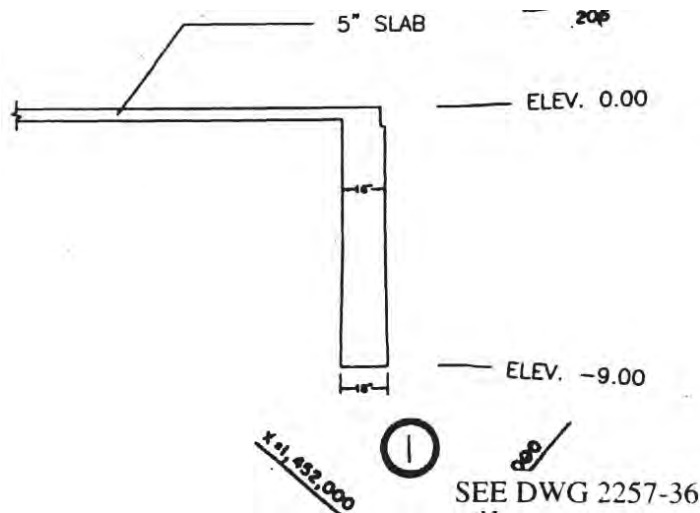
Seawall Section A, Bulkhead Type 2
